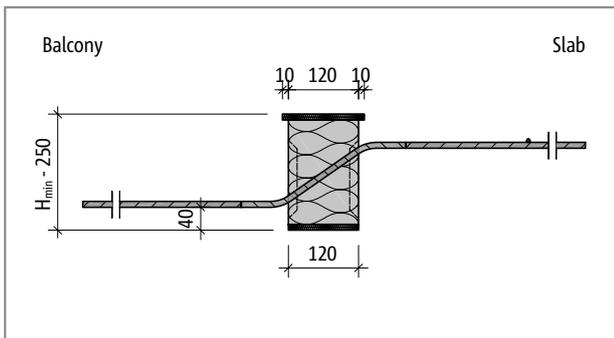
Schöck Isokorb® XT type Q-PZ: Product section
